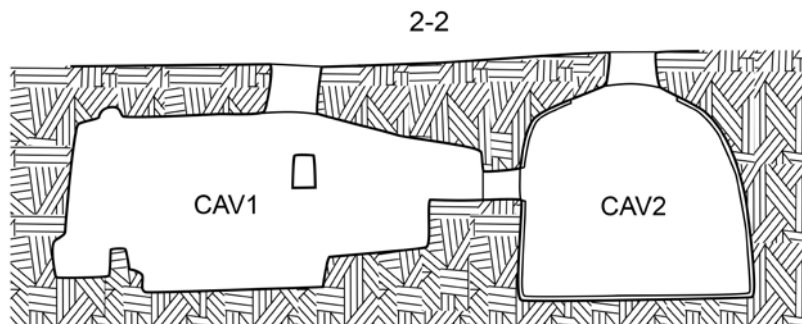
Hiding complex, a reconstruction of the section of usage period. Drawing by Dvir Raviv.
